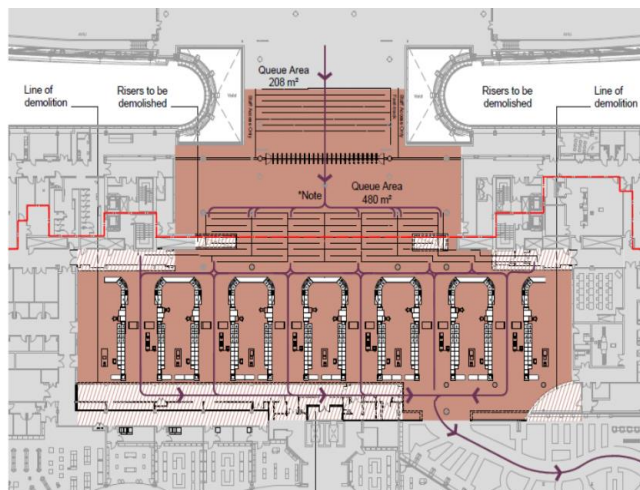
New Terminal 2 Check-in Proposed layout (Indicative)
